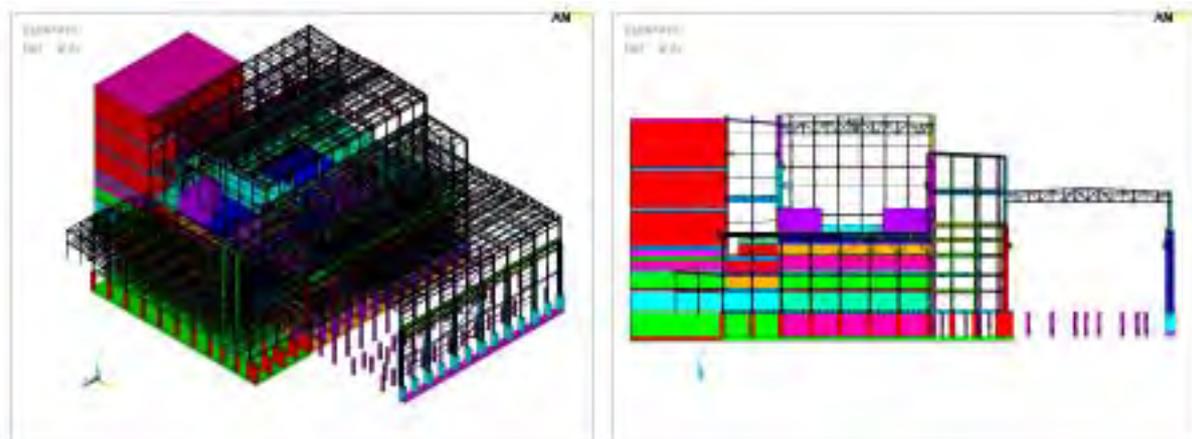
FEM model (total view – load bearing structures of facade and roof structure, longitudinal section)
